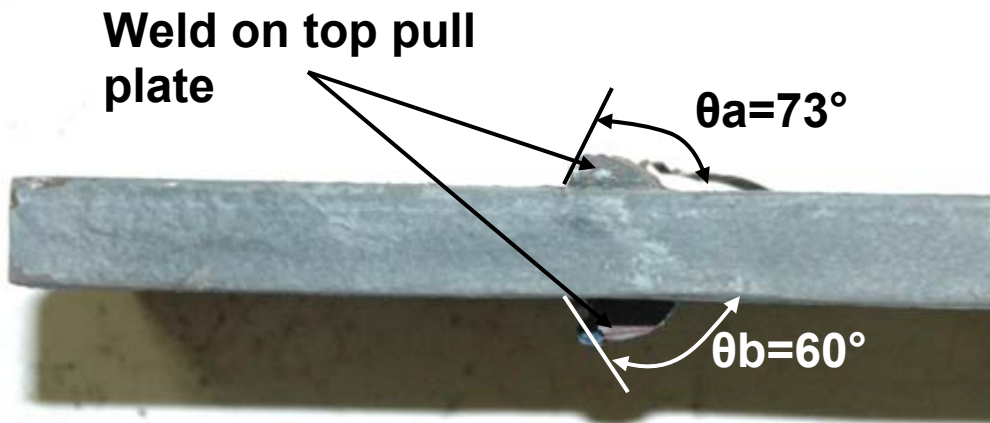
Photograph of a side view Specimen P2, where the profile of the fractured weld on the top pull plate is visible
